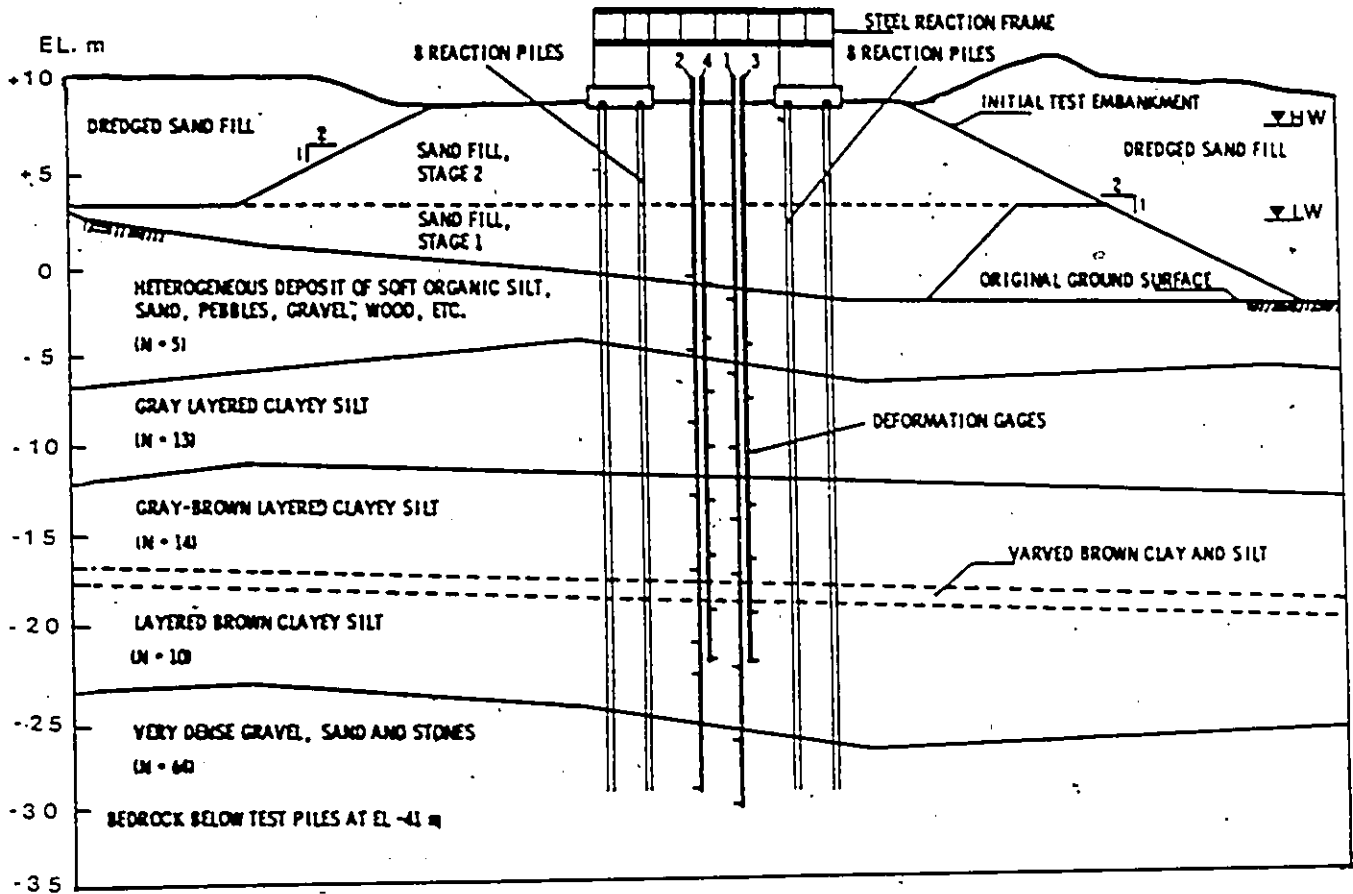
Profile of soil formation, embankment fill and test piles (after Bozozuk et al. 1978)
